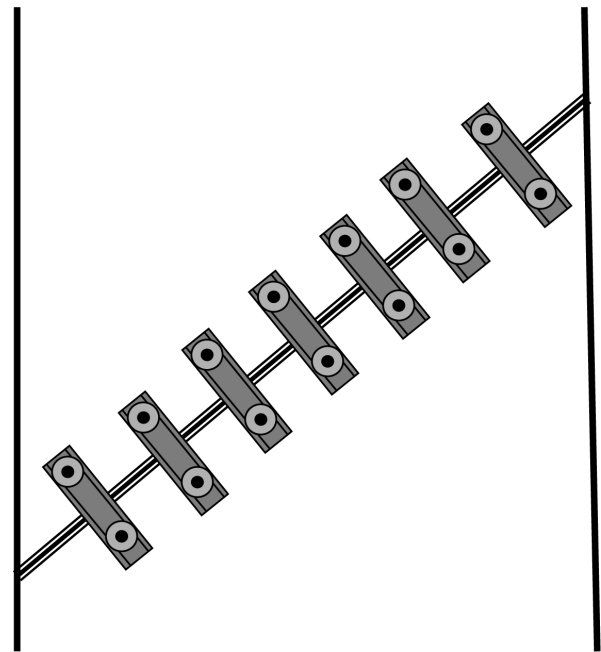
Plan view of suggested method for supporting with W-straps a joint of which the dip is very steep or difficult to ascertain
